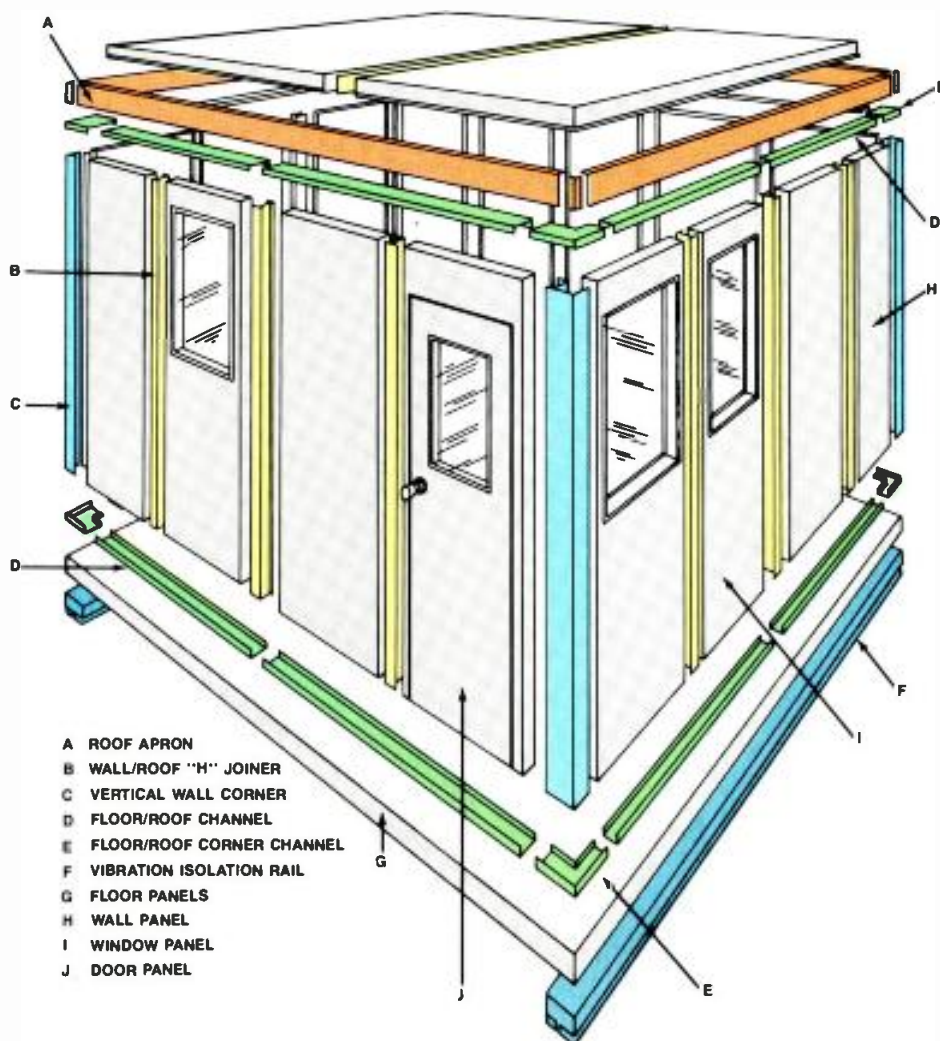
Exploded pictorial view of a typical modular room. Floor panels (G) are usually of tongue-in-groove design. Floor/roof channels (D), corner channels (E) and joiners (B) are all pre-cut to size. Some manufacturers use tongue-and-groove for wall panels as well, thus eliminating joiners. (Courtesy of Acoustic Systems.)
